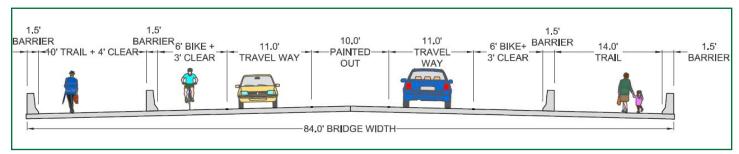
Partial Build Out of Tower Terrace Road Bidge
